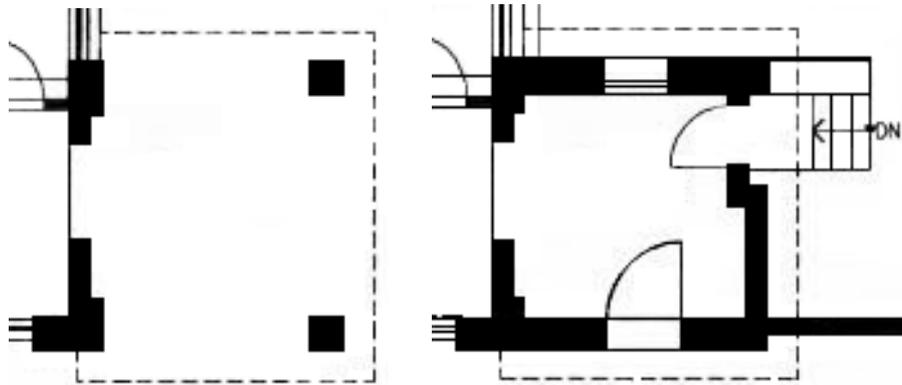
The schematic plan of the original layout (left) and latest layout (right) of the former entrance porch.
